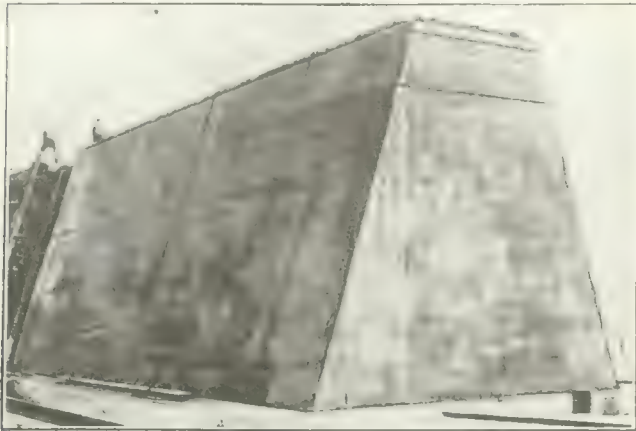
CONCRETE CAISSON FOR BREAKWATER READY FOR LAUNCHING
